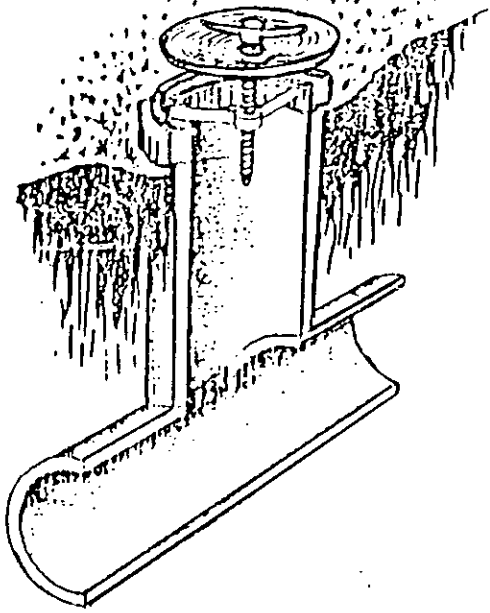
An Outlet Valve Mounted On Concrete Pipe
